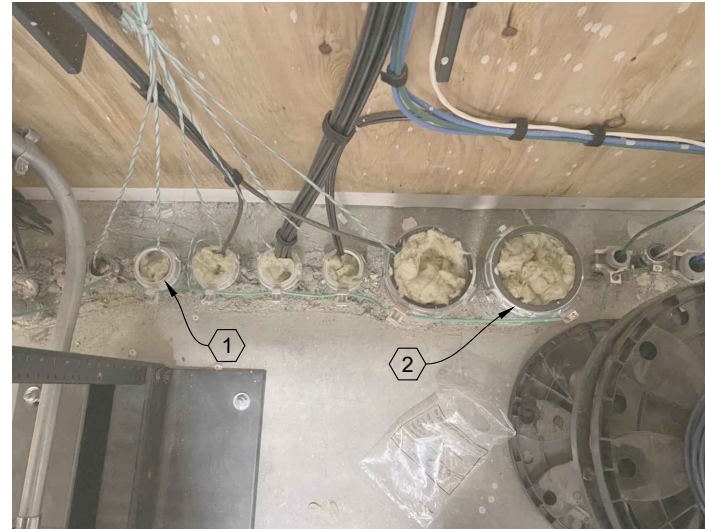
FACING SOUTHEAST IN ADMIN WAREHOUSE MEZZANINE
